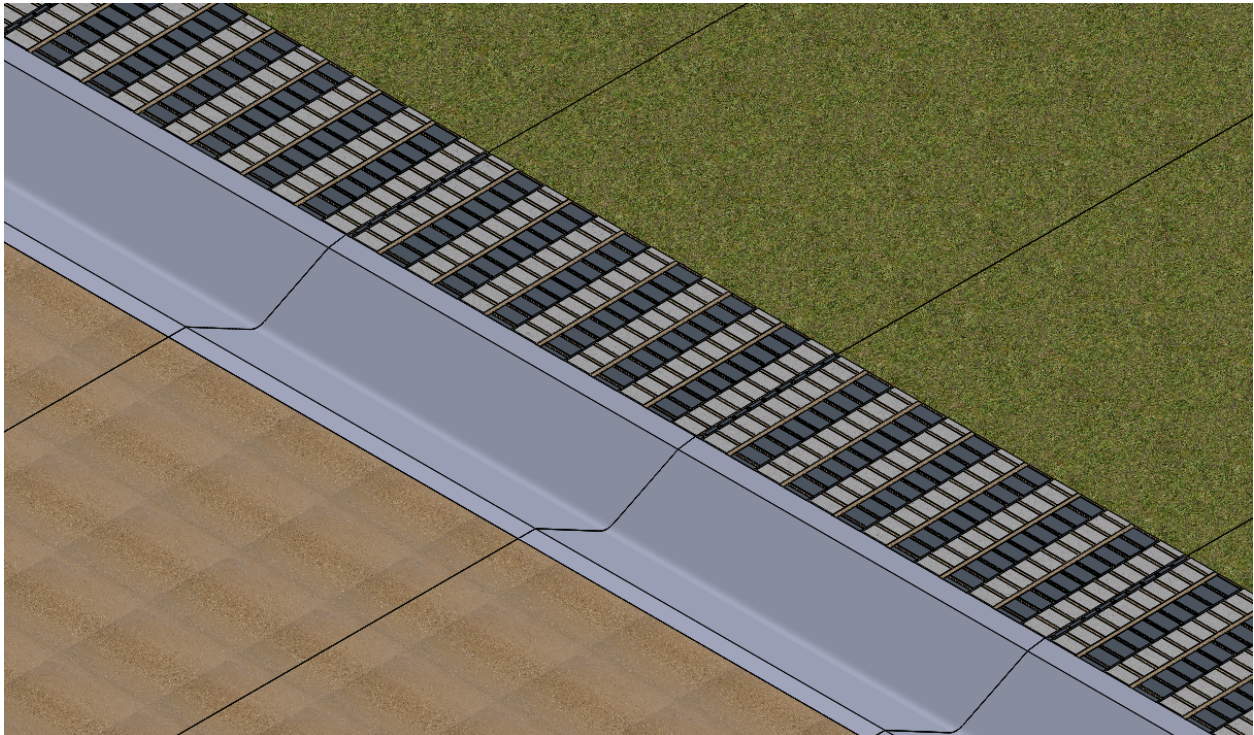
Design 2.a pictured as applied near a roadway with adjacent culvert.
